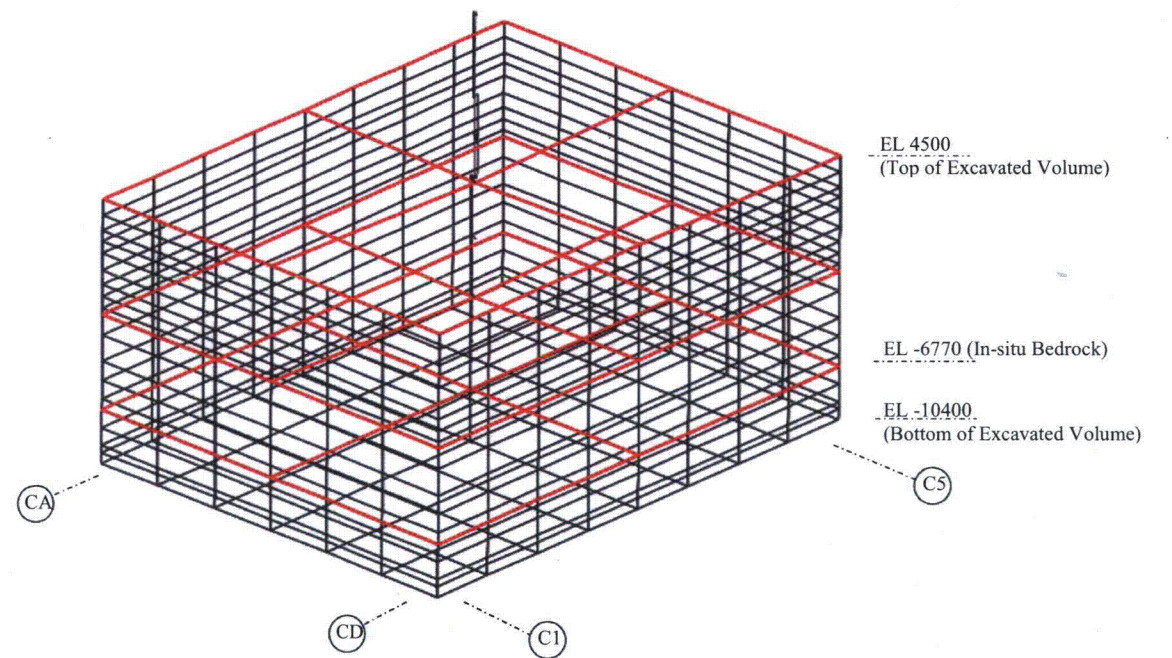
(5) SASSI2000 Plate Elements for CB Exterior Walls
